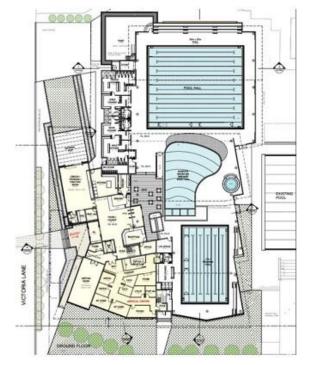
Site Plan – Hunt Architects (north is to the bottom of image)
